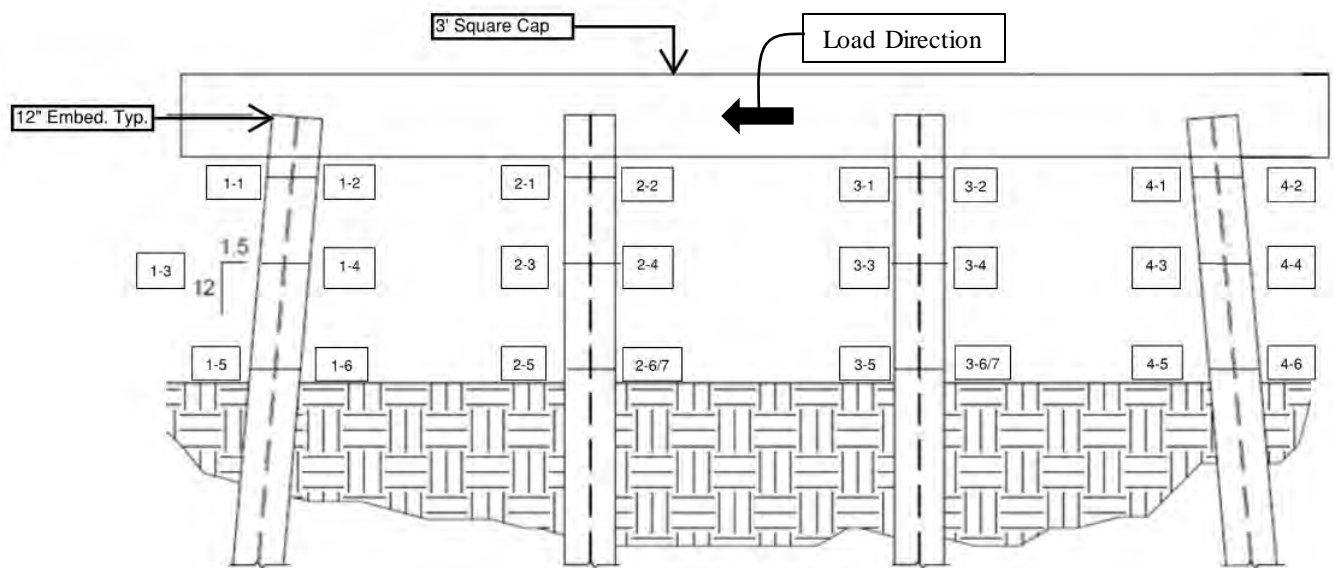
AUNGES Battered Pile Test Bent Gage Locations
